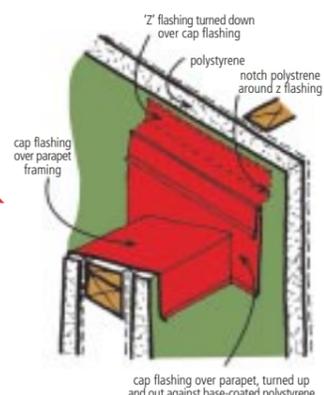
Back-flashed junction between a balcony or parapet wall and an adjacent wall.
